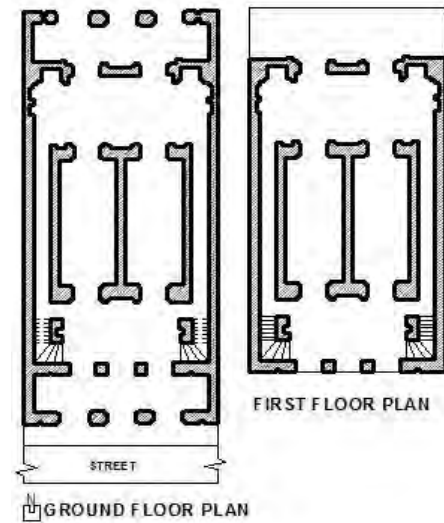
Plan of Building no-27, Source-Dept. of Archeology
